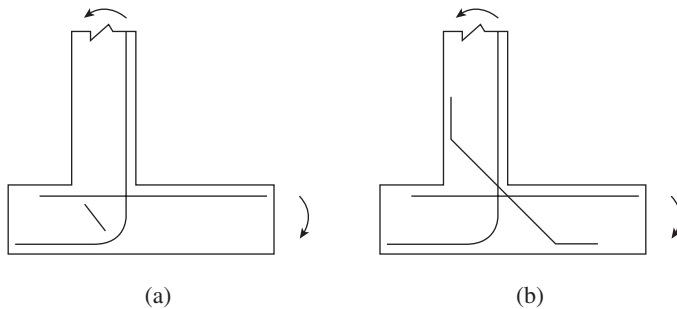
Layout of reinforcement in retaining wall corners (a) Normal detail (b) Addition of diagonal bar
